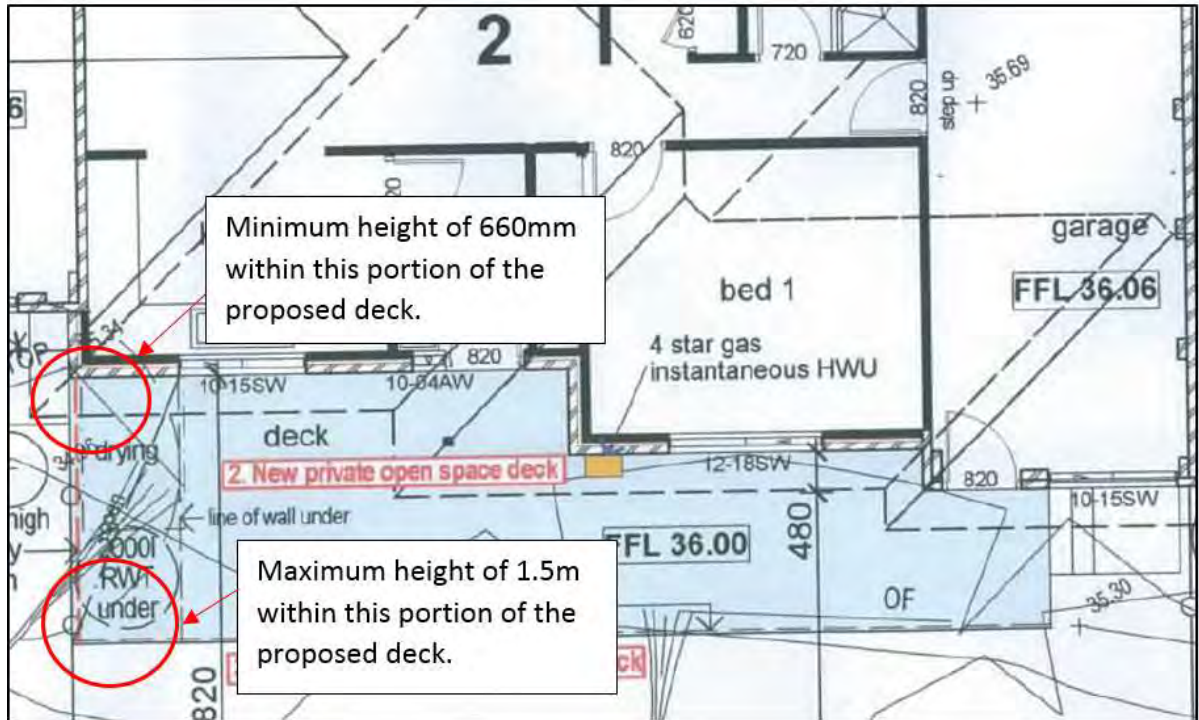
Plan and elevation indicating the height of the proposed deck for Unit 2.
